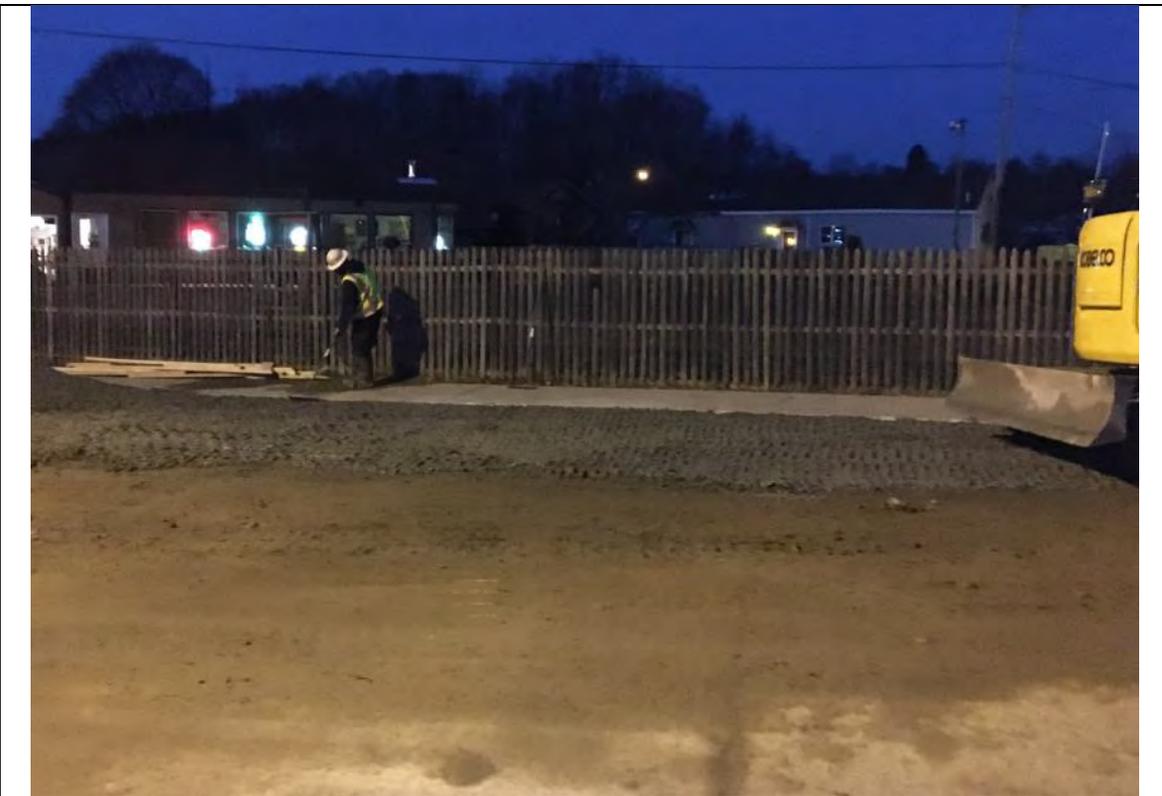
| Box Culvert – View facing southwest depicting timber supports
